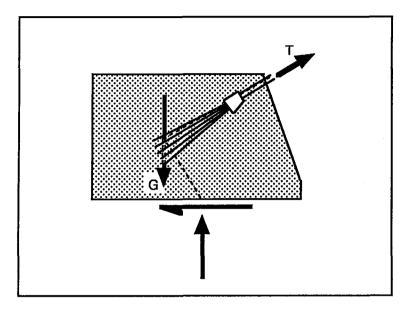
GRAVITY TYPE ANCHOR BLOCK
